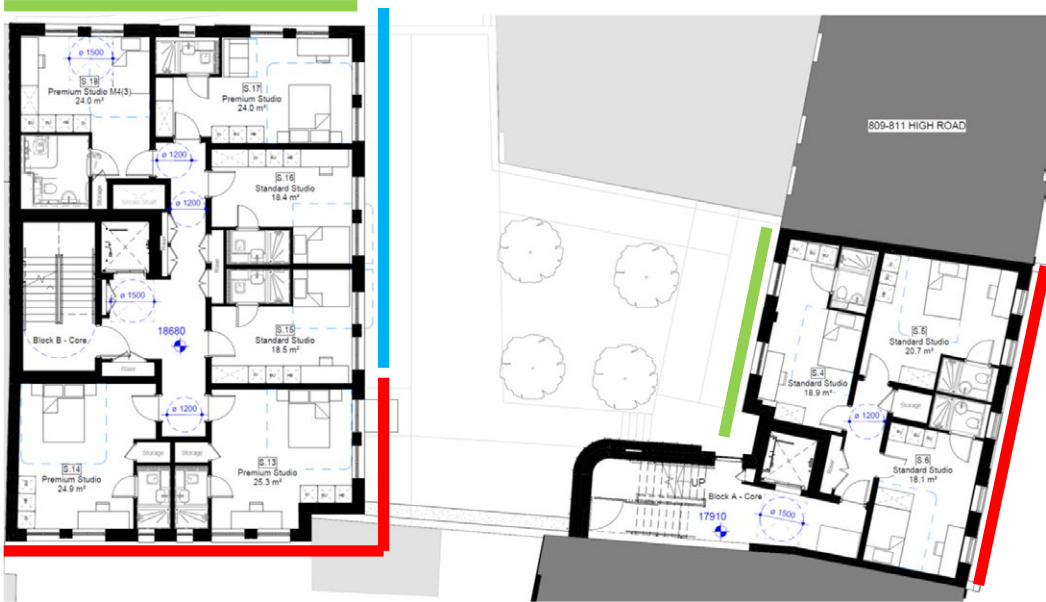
Facade identification and extent of proposed ventilation - All floors
